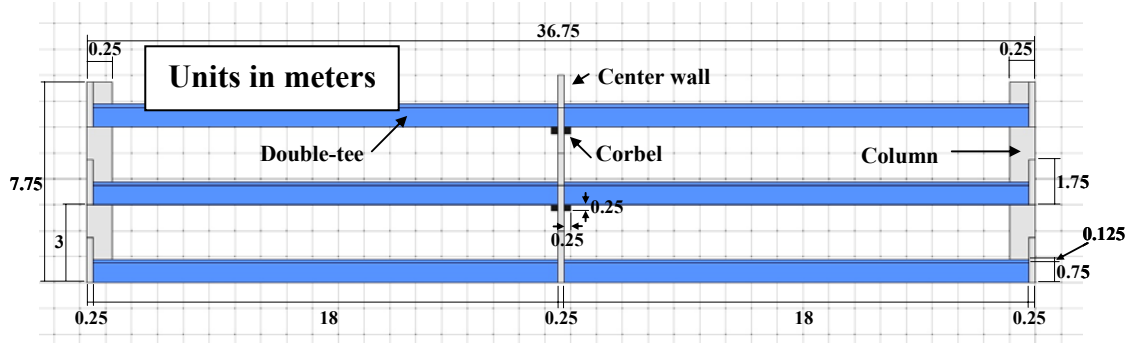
East-west elevation view of FDS model with level floor elevation.
